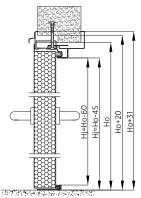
Installation of a double-leaf door to a masonry wall – wrap-around frame with a thermal break – vertical cross-section
